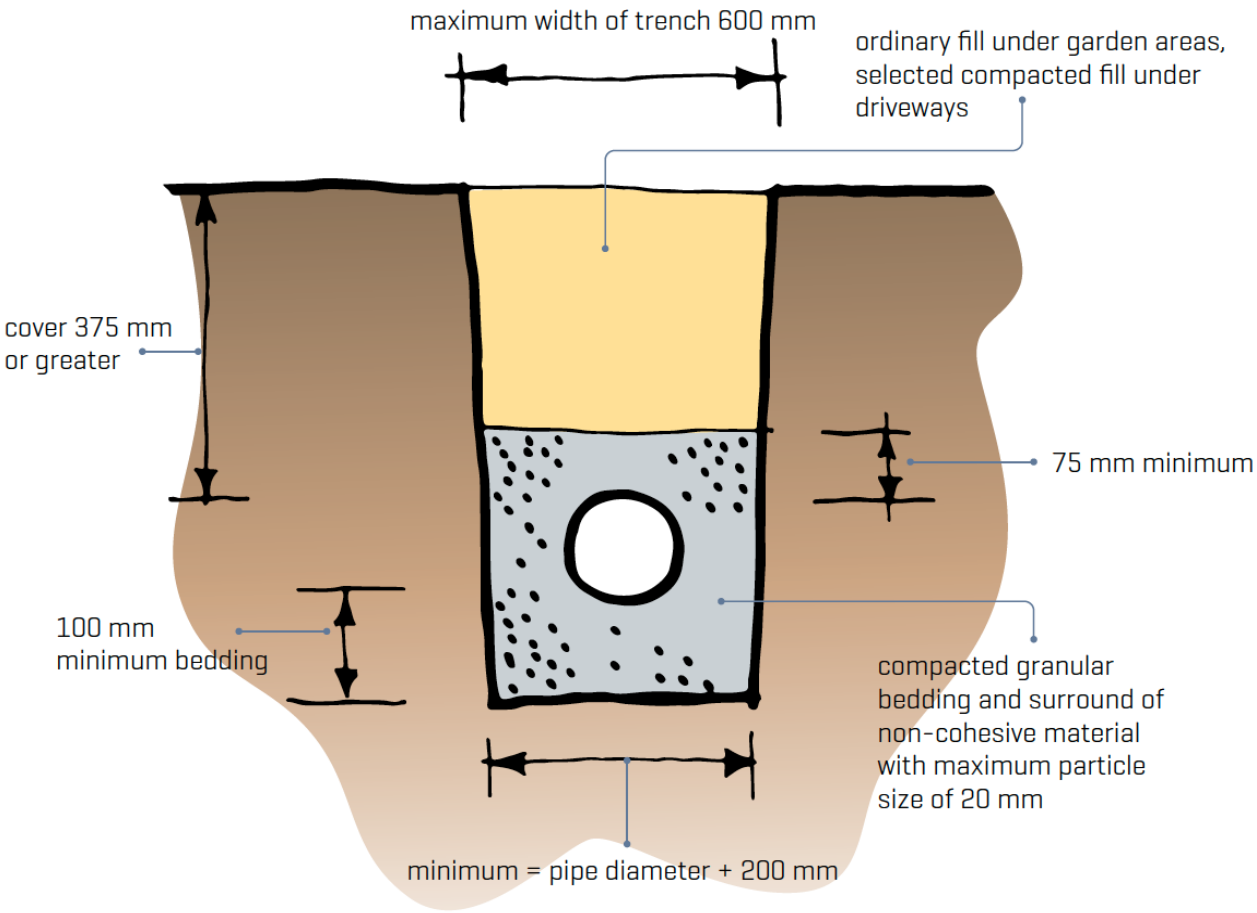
Bedding and backfilling where cover over drain is 375 mm or greater.
